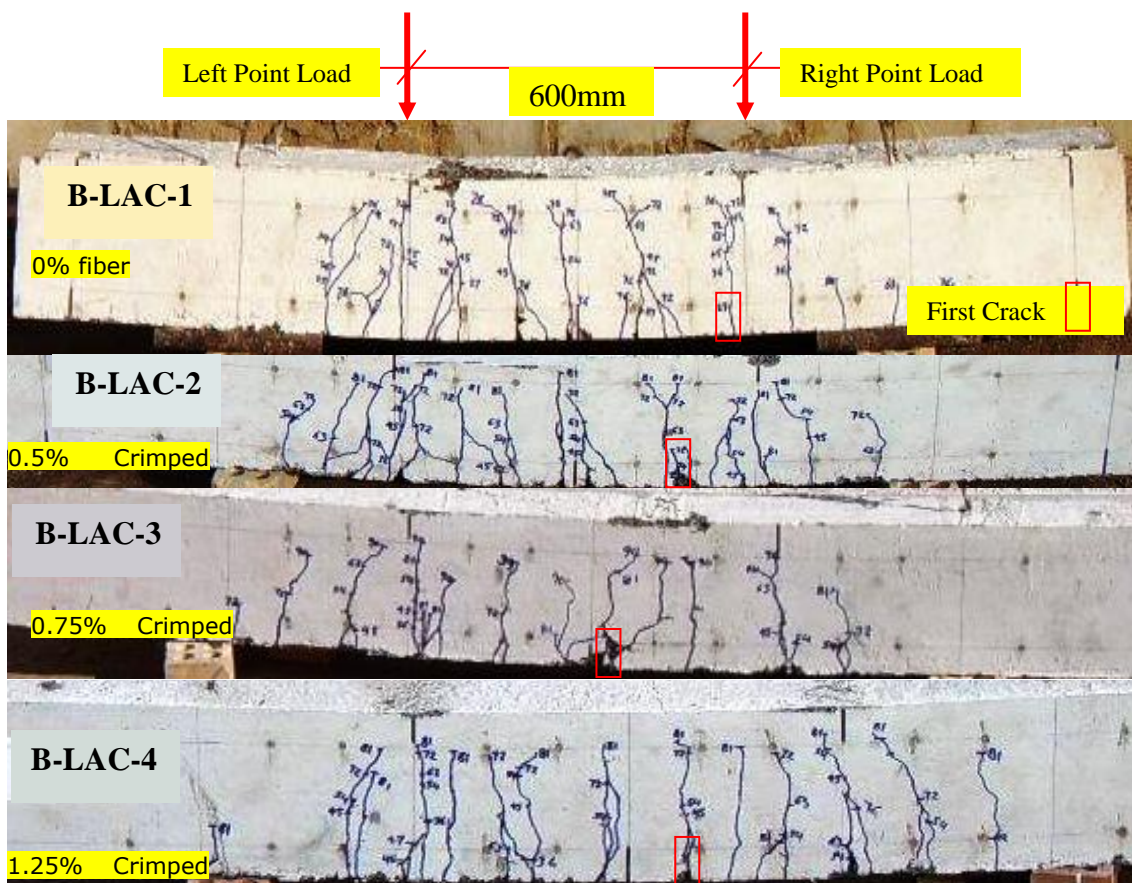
Crack Patterns of HPLWC Beams after Failure with/without Fibers
